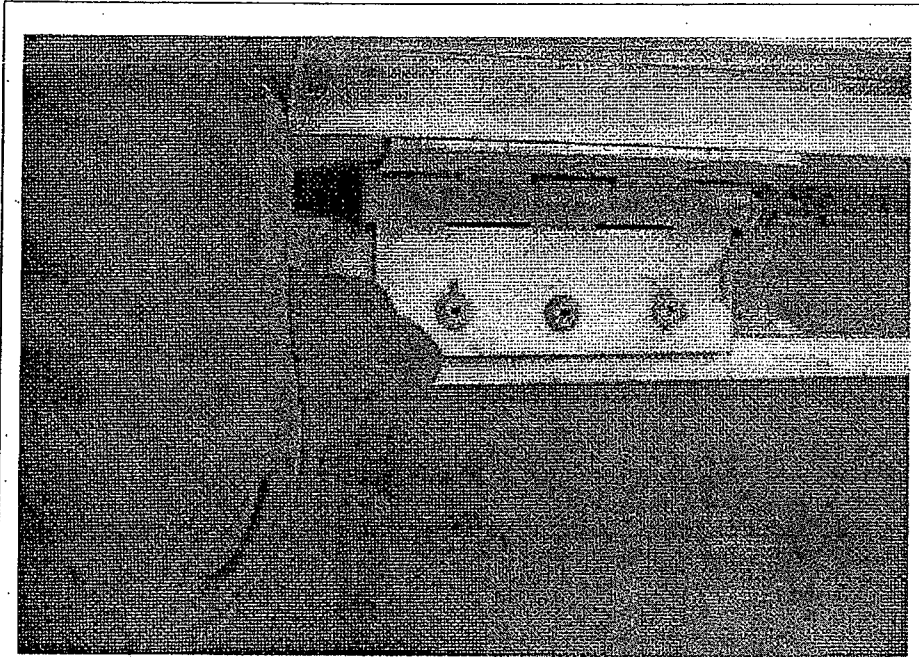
Windows and Louvres – Corroded window hinge fixings.
